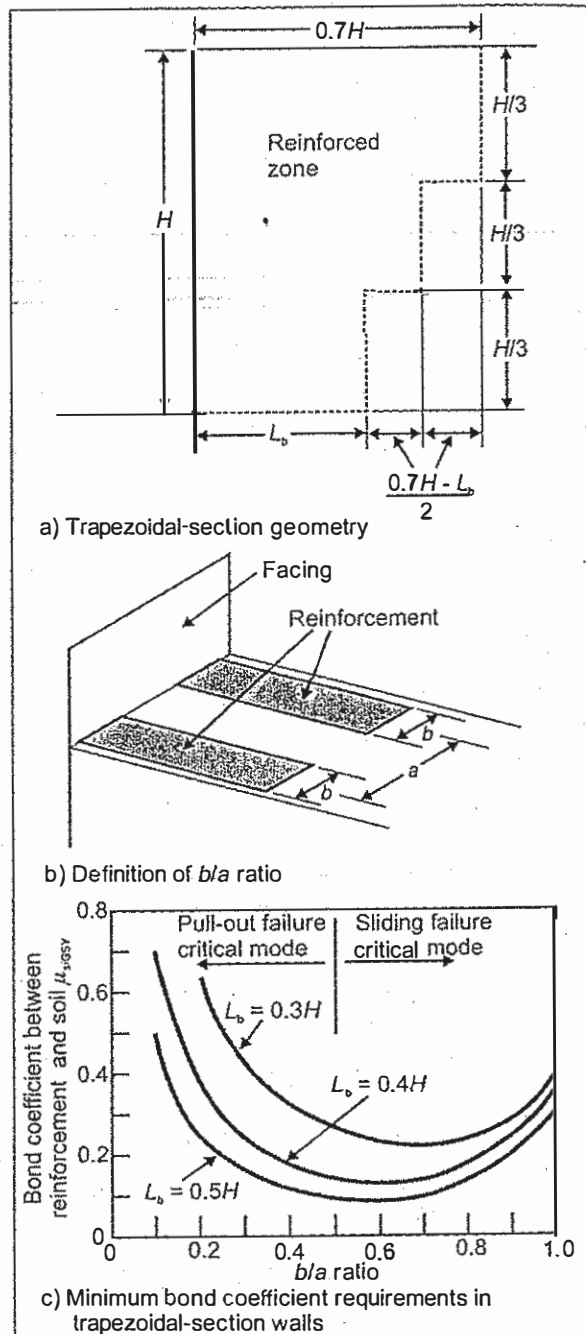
Required minimum reinforcement bond coefficient for trapezoidal-section walls at the ultimate limit state.
